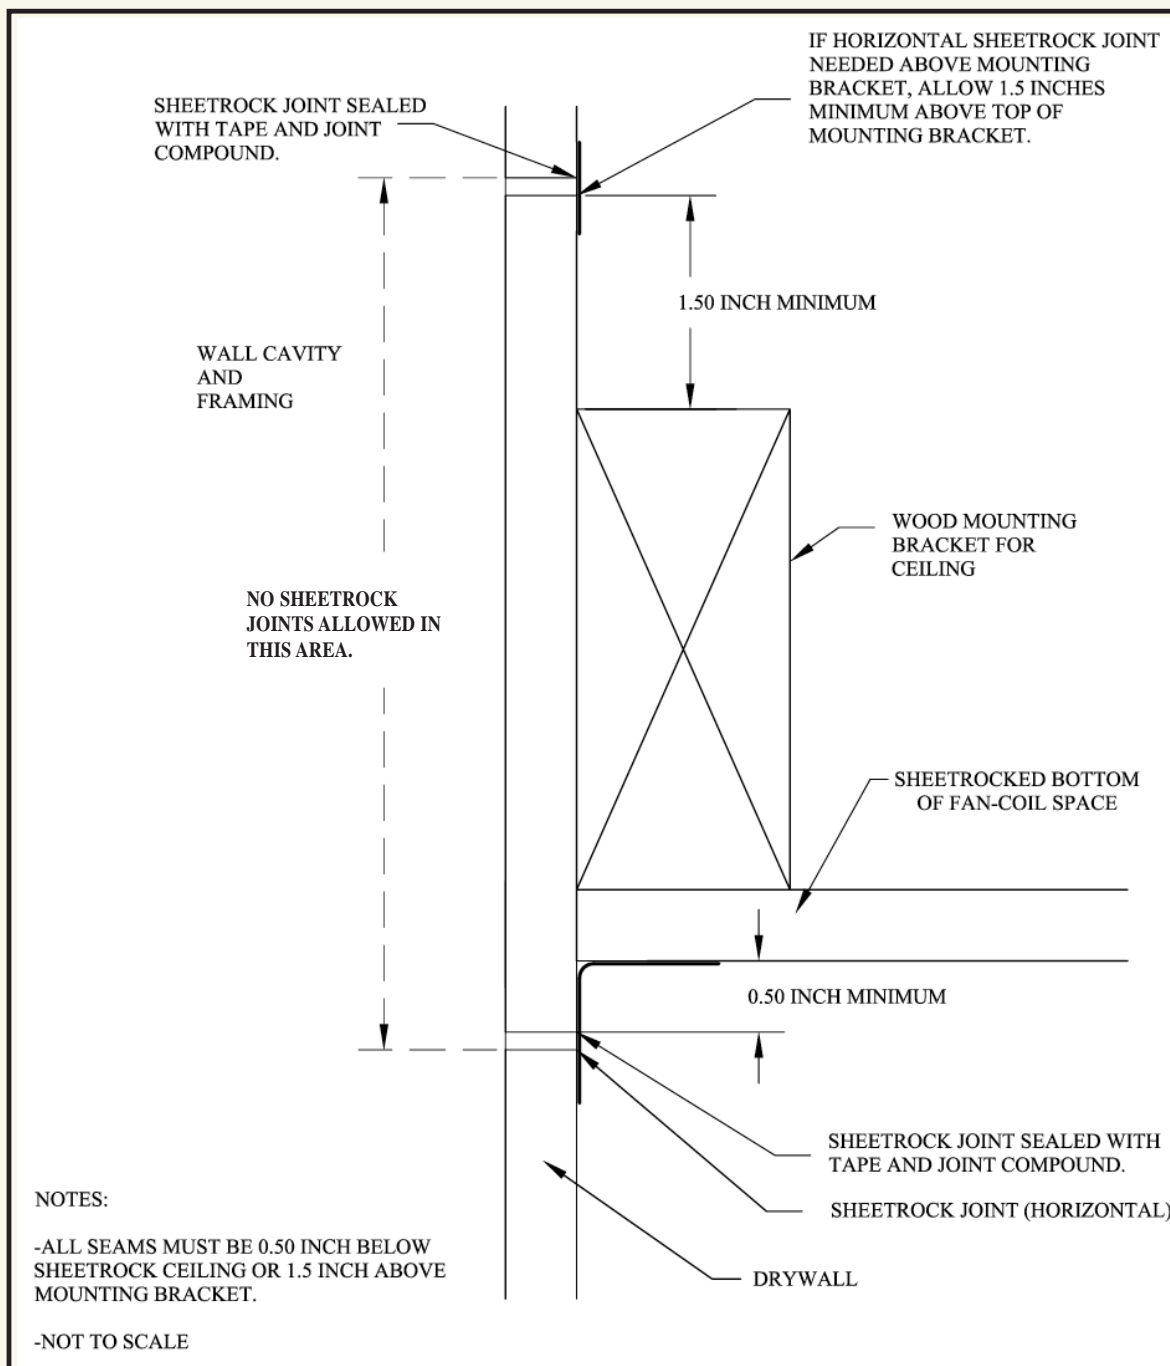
Cross-section drywall details for fire code separation for multi-family, non-ducted ceiling returns for fan coil units – Wood Bracket
